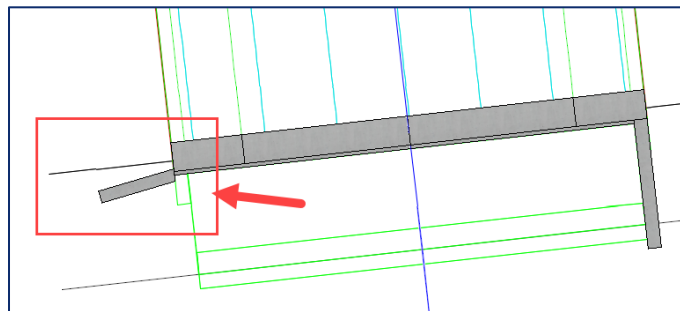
Inline wingwall with a -10° 00' 00" skew
